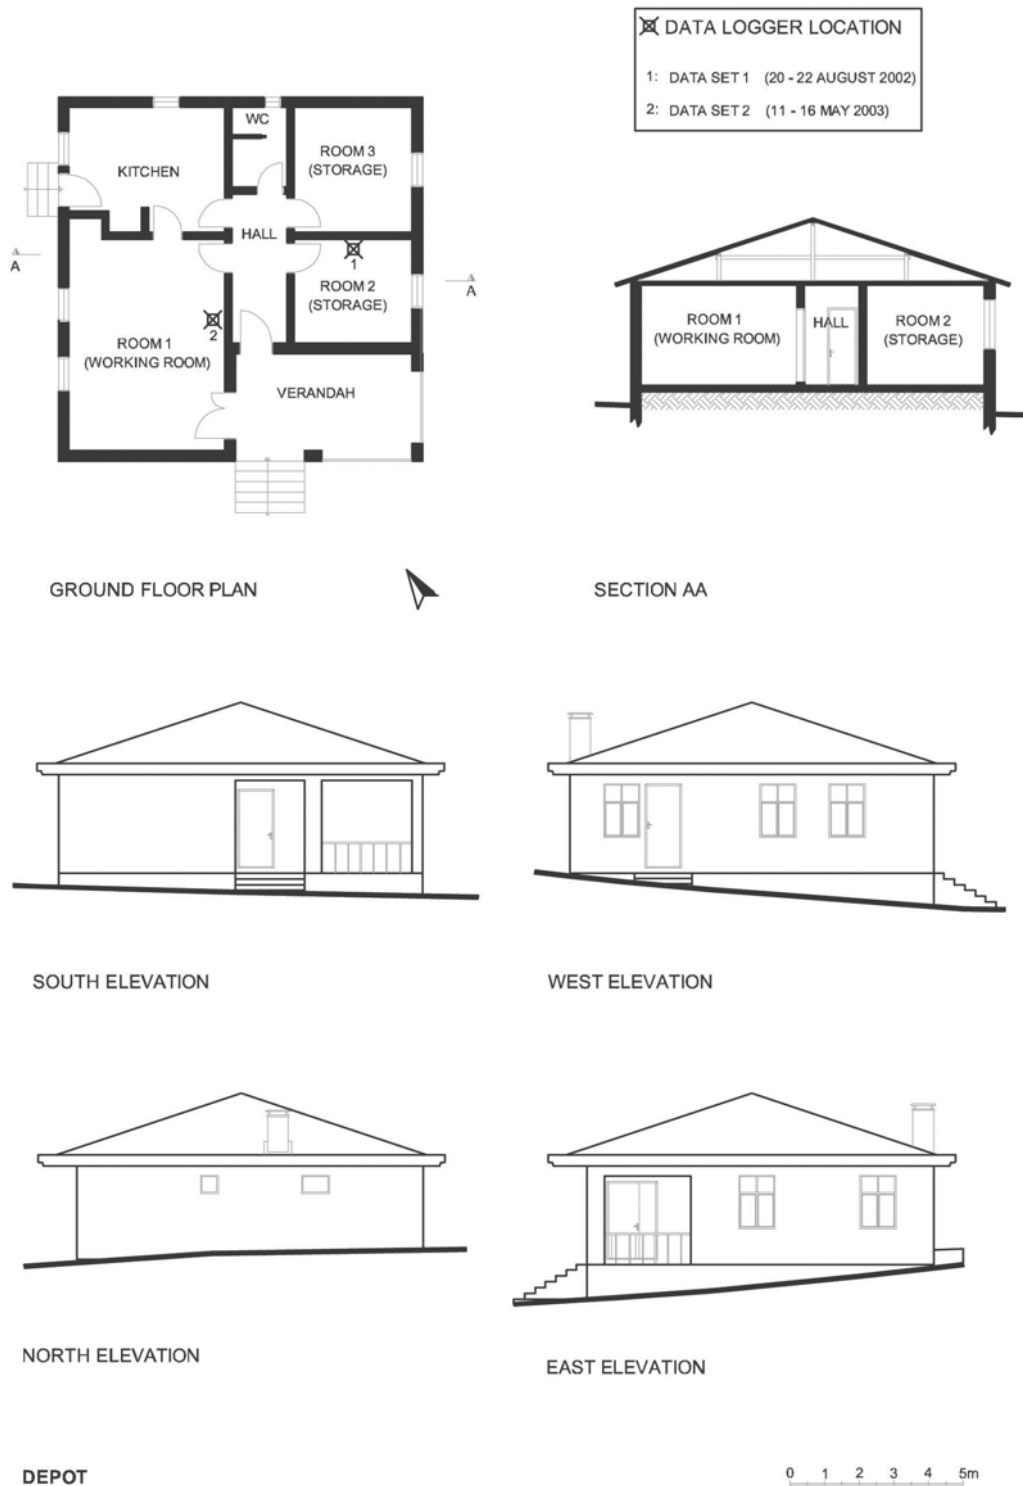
Orthographic Drawings of the Kerkenes Depot House
